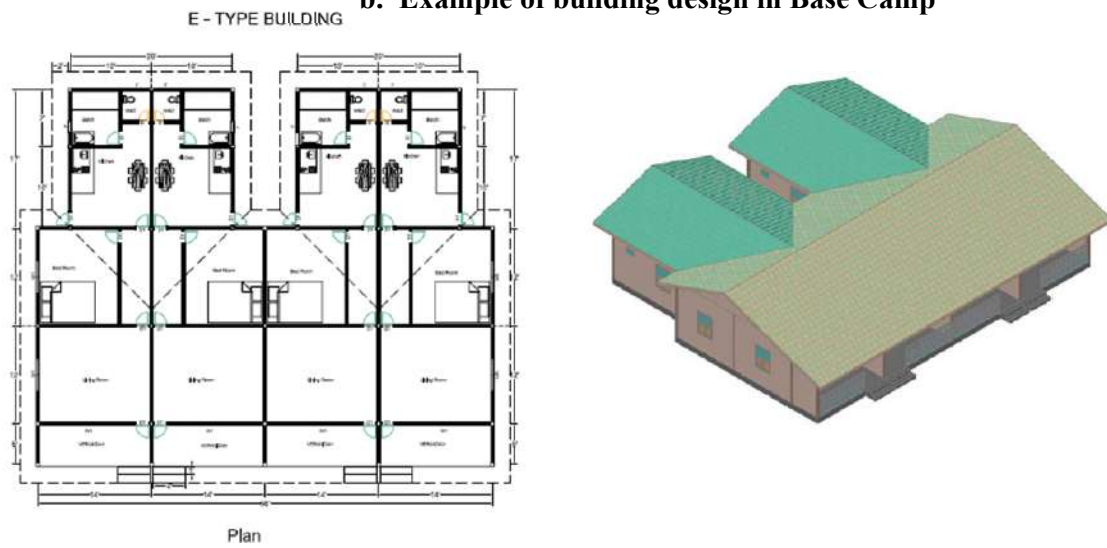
shows examples of the base camp and building design introduced in Baluchaung (3) Hydropower Project.
